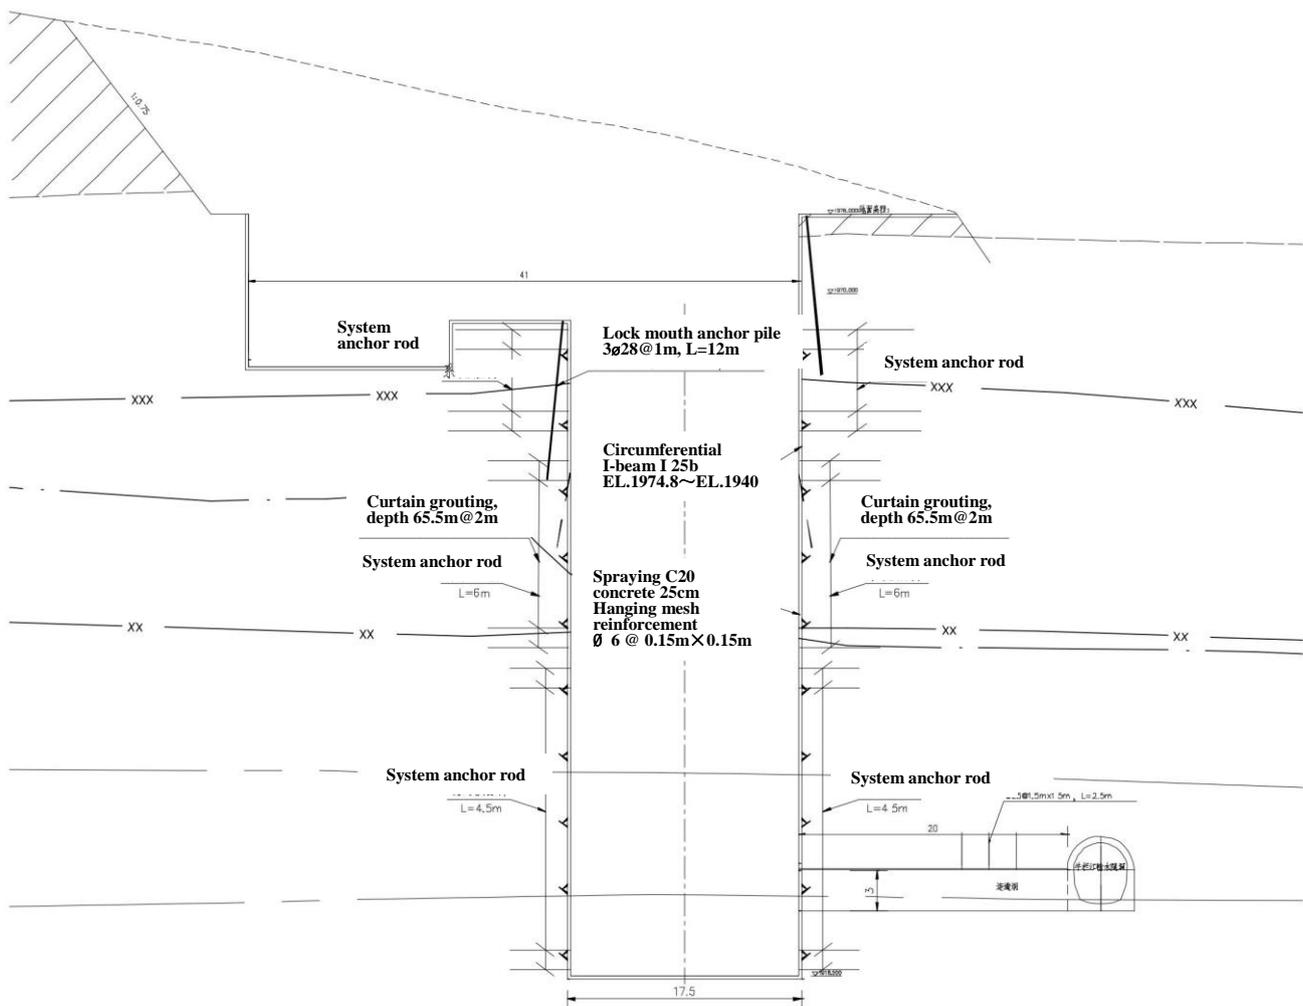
Cross section diagram of excavation and support for the working shaft of the pumping station.
